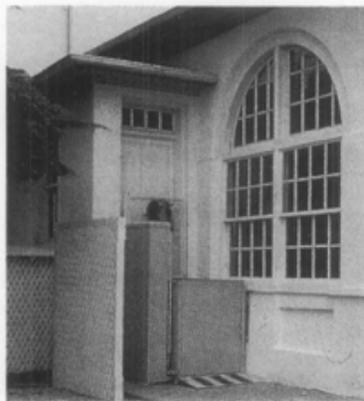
Platform lifts like the one used on this building require minimal space and can be removed without damaging historic materials. Shielded with lattice work, this lift is also protected by the roof eaves. Approach path should be stable, firm, and slip resistant. Photo: Sharon Park.
